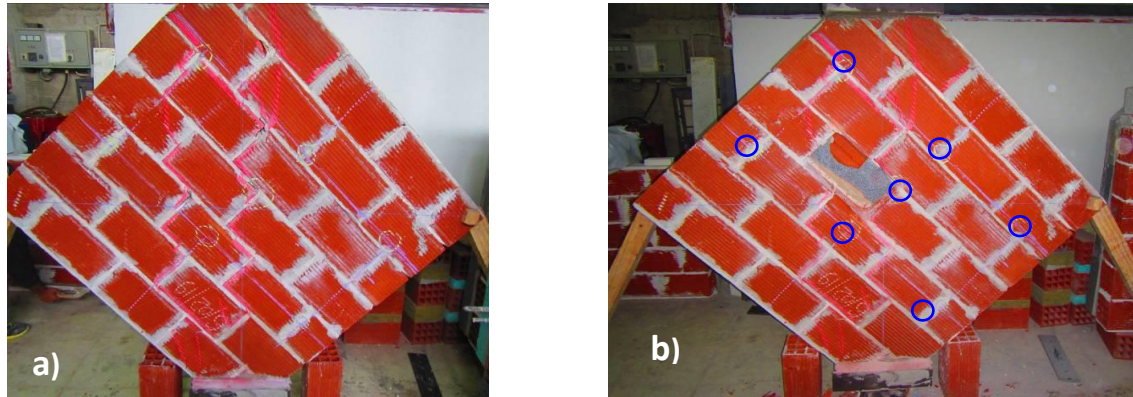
Observed damage from diagonal compression of wallet with a thermo-insulating façade constructed with Gray-EPS 100mm thick panel. a) View of brick façade with diagonal cracking b) View of brick façade with diagonal cracking and removal of broken brick.
